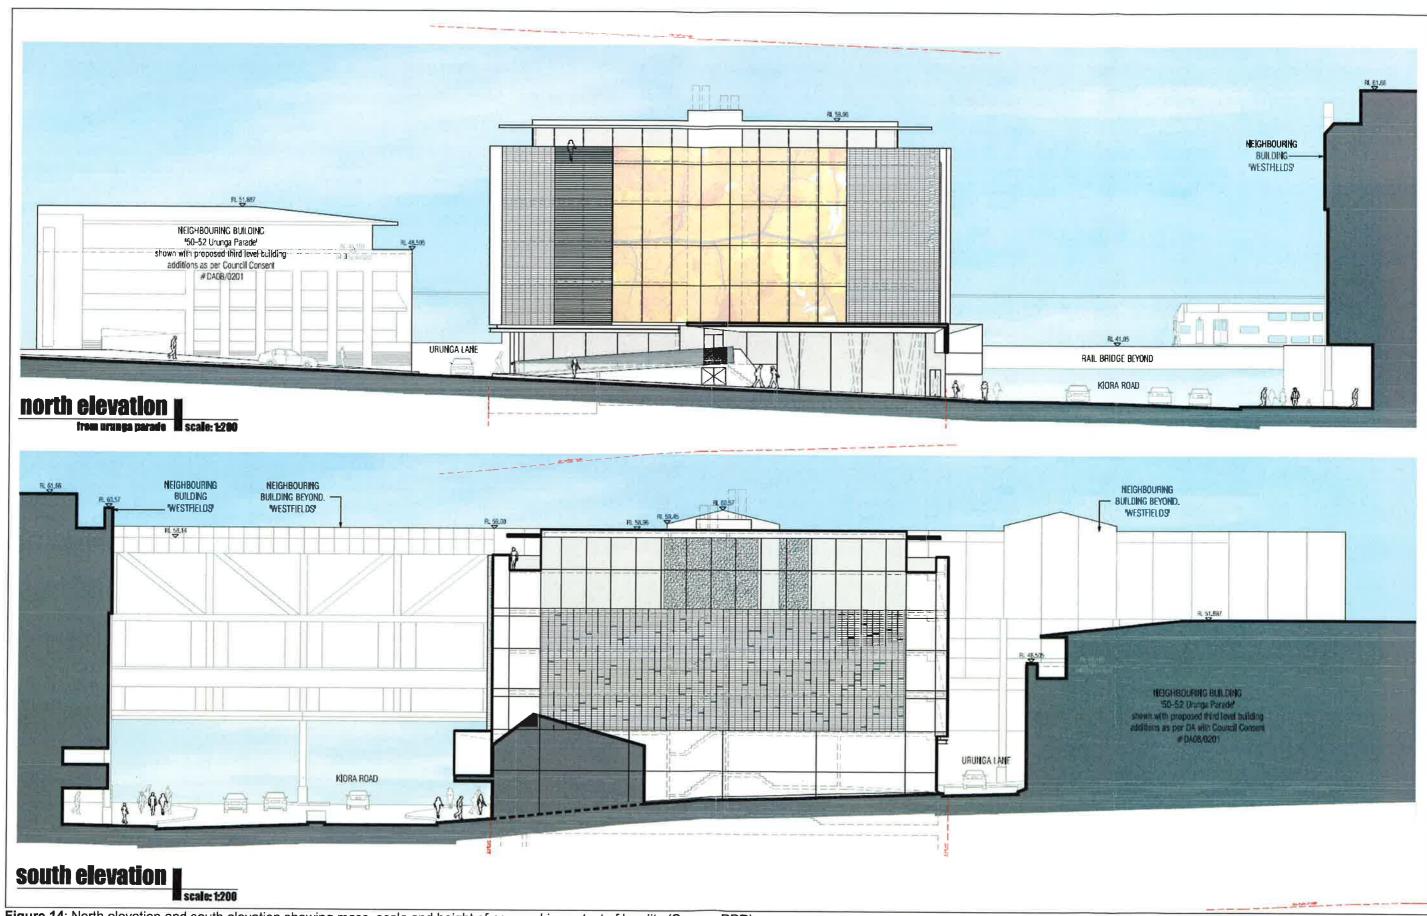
North elevation and south elevation showing mass, scale and height of proposal in context of locality (Source: PPR)
